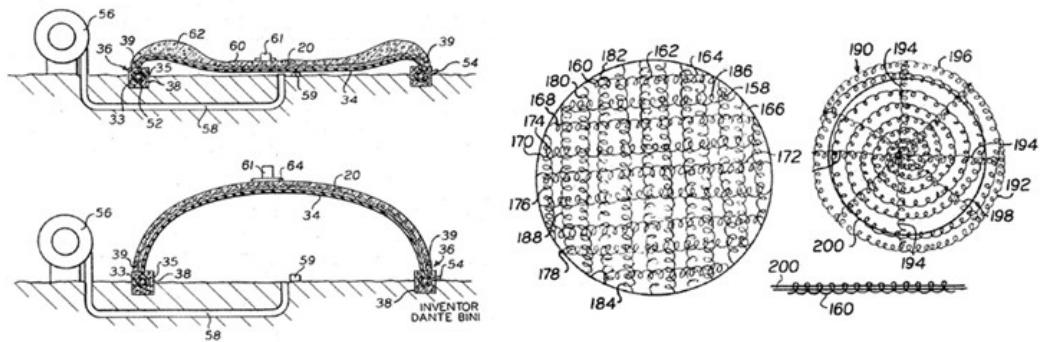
Stages of construction of the Domecrete Building System. Adapted from [31].
